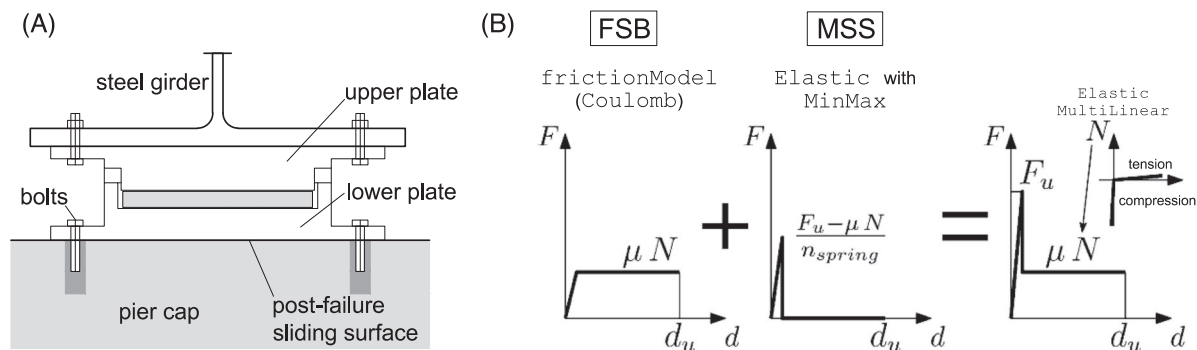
Fixed bearings: (A) bearing section, (B) mechanical model.
